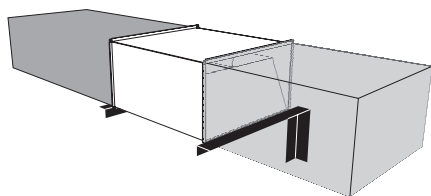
Fixing the fan to the floor, wall or ceiling
